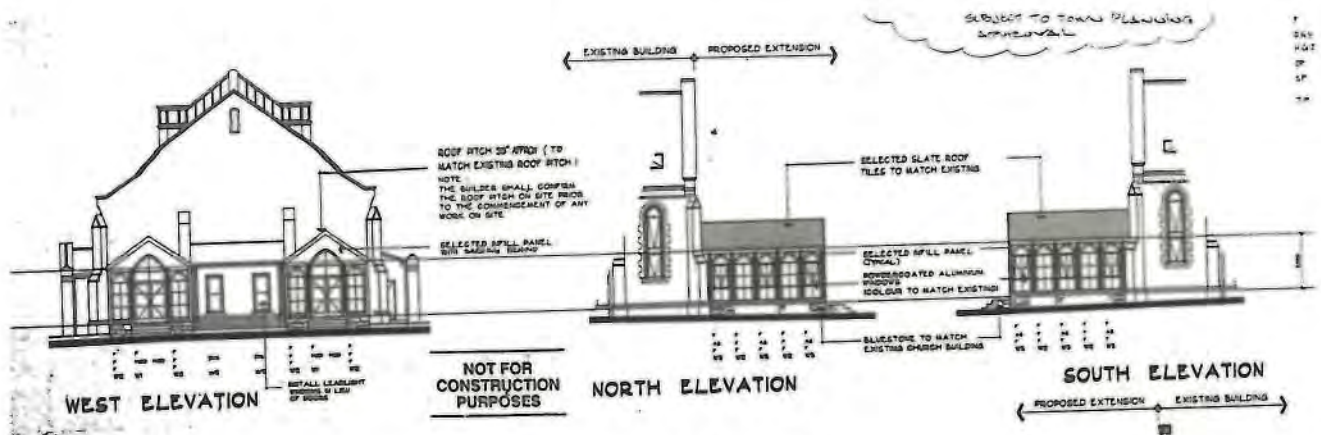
1994 plan showing conservatory addition to the rear of the church
